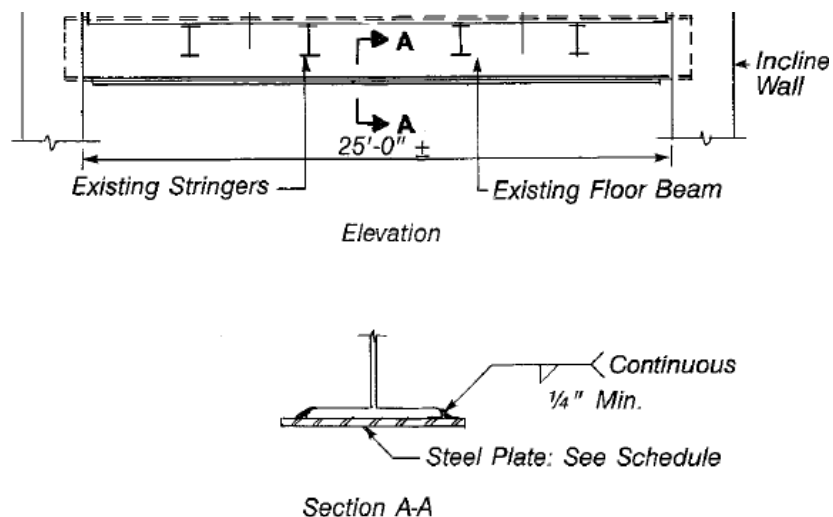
Typical Framing Steel Repair at Temporary Incline
